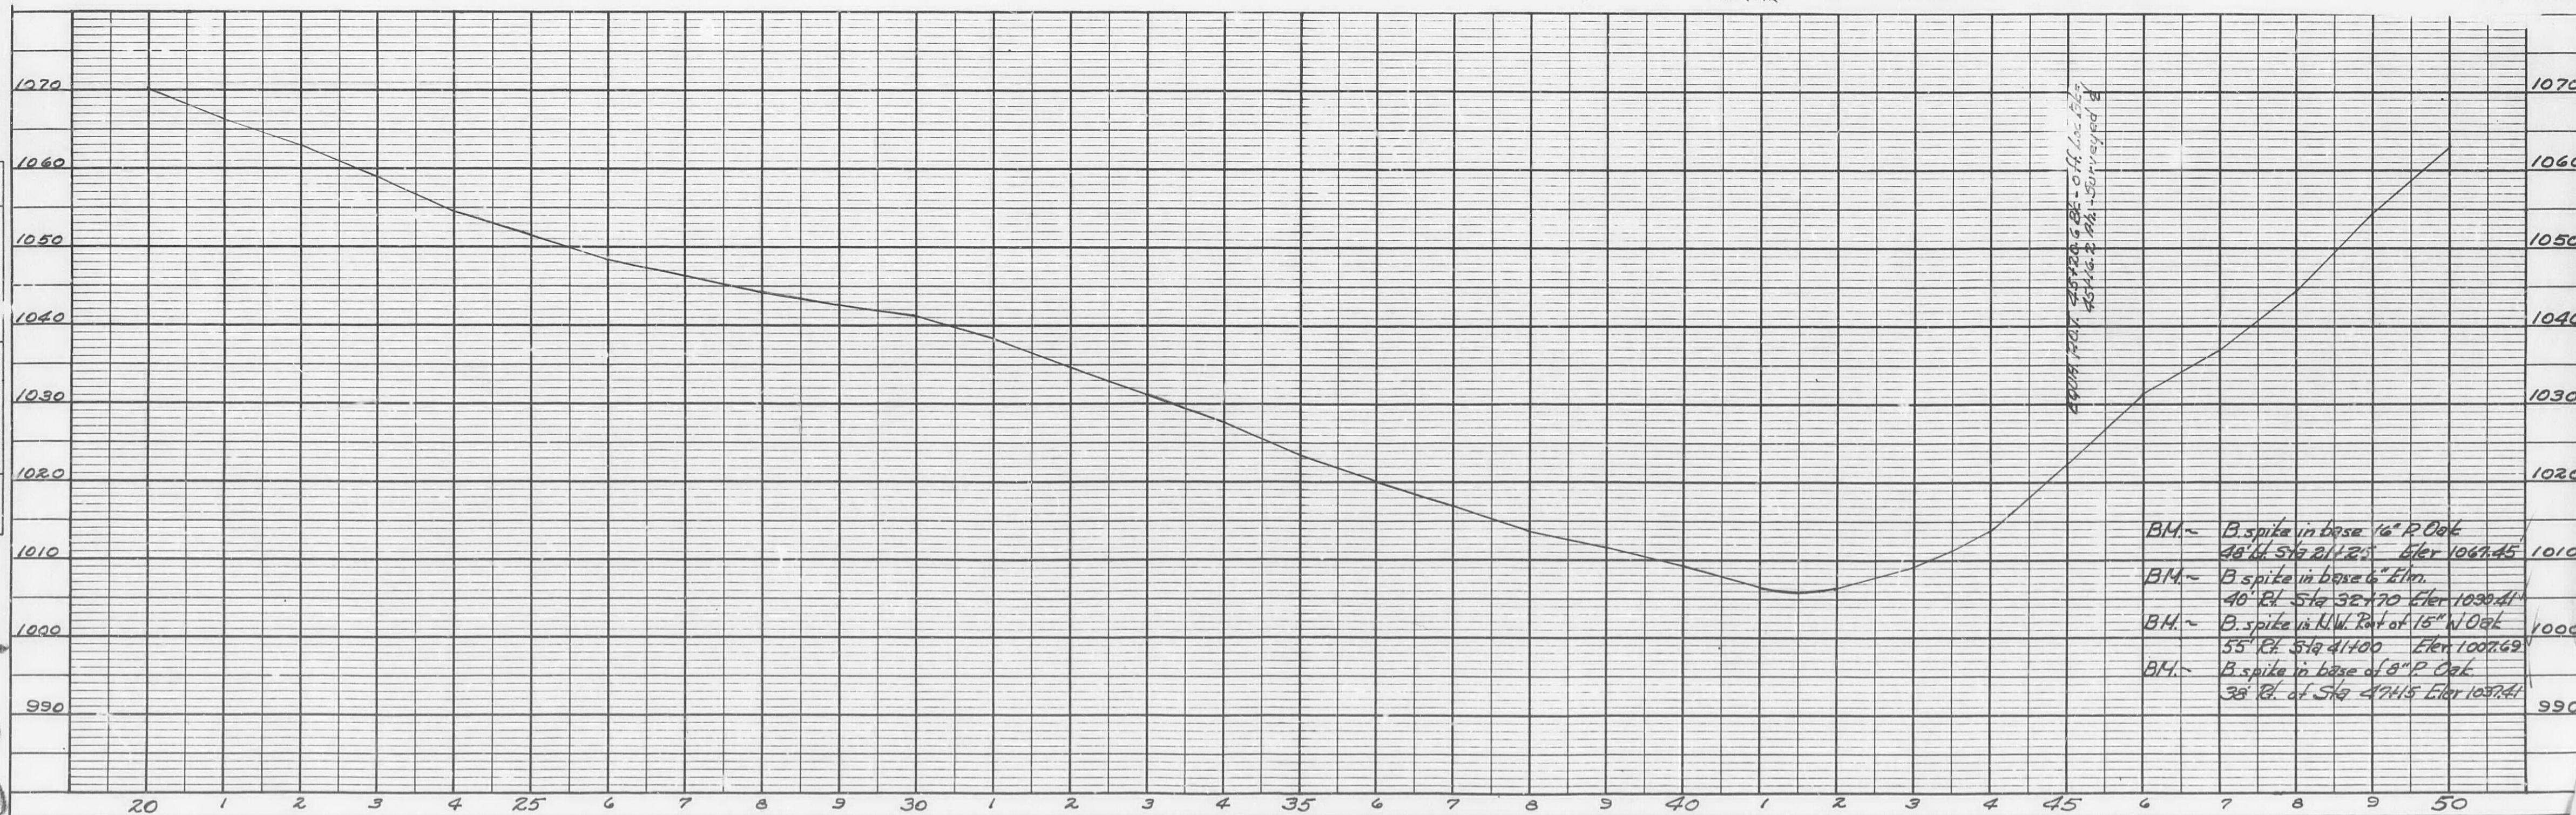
PLAN—PROFILE O. P. R. & R. E. STANDARD
